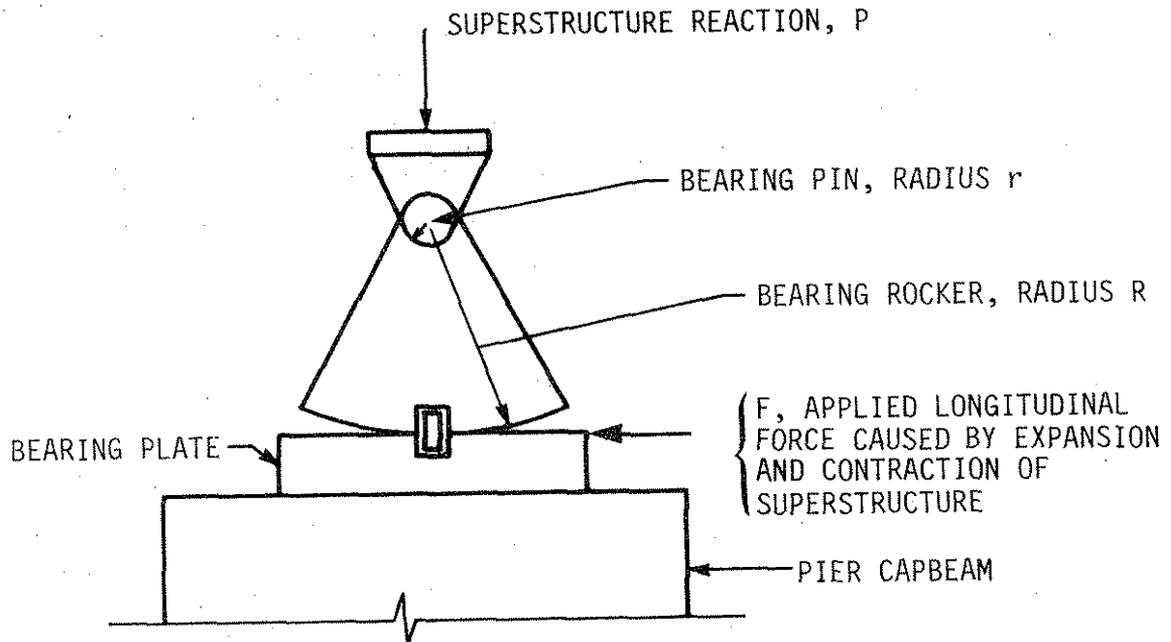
Expansion bearing illustrating longitudinal forces transferred through bearing device.
